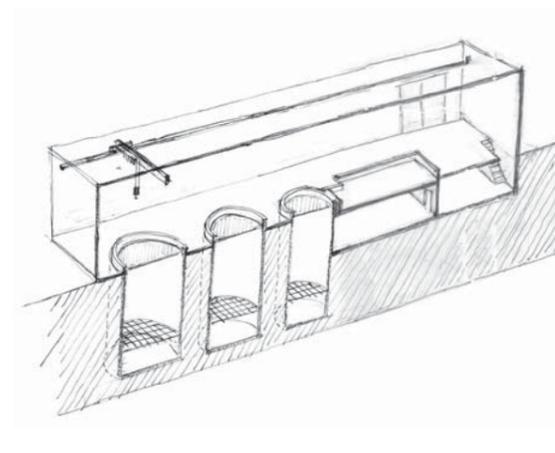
The spent fuel store at Studsvik showing the main hall as well as the interface between the building structures and the underlying soil and rock. It was built in 1962-64 and is still in operating condition. It was used for storage of spent fuel from the Ågsta pressurized heavy water power reactor operated during 1963-73. Artist's view.
